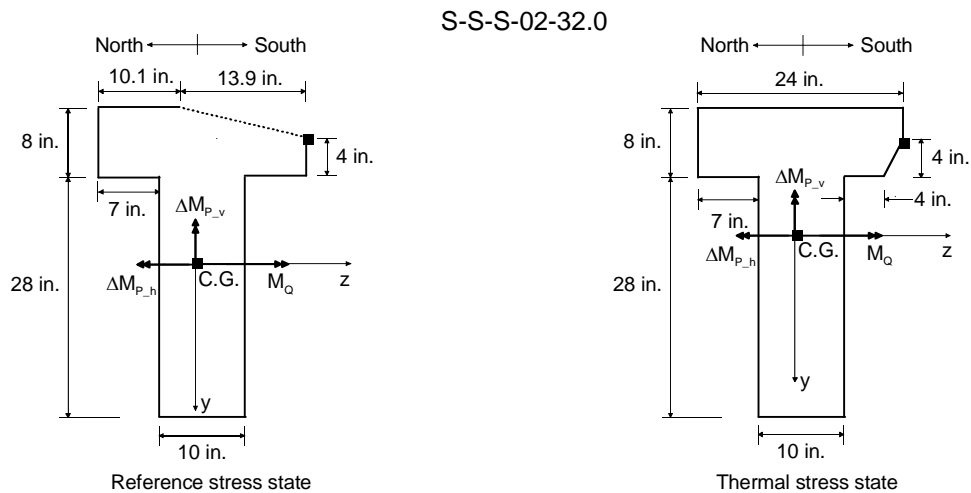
Contact areas at joint J2 at incipient joint opening on North side at elevation of 33.5 in.
